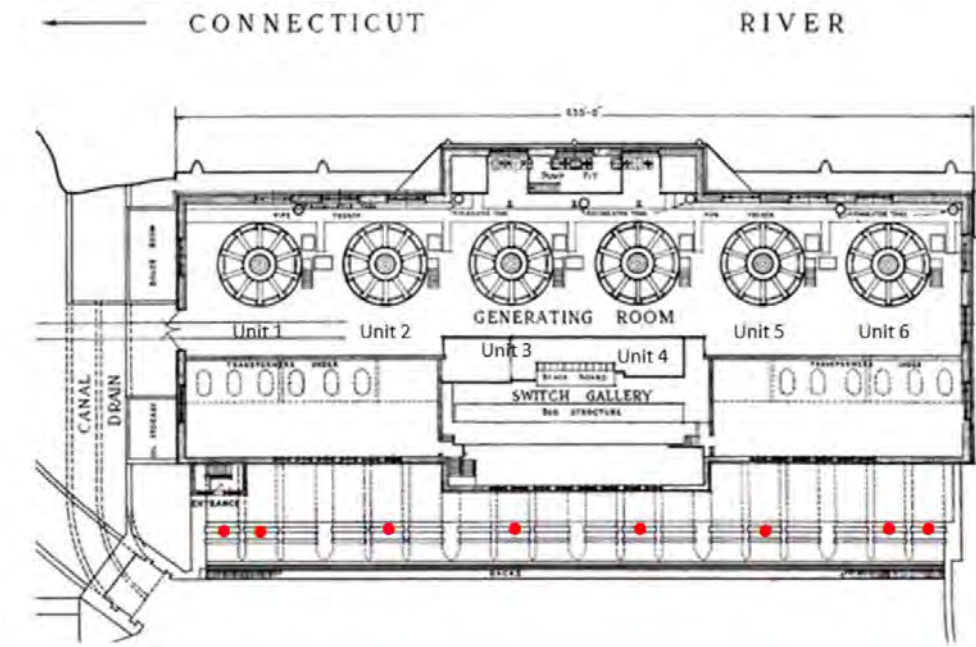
Plan view of Cabot Station, Turners Falls, MA. The red circles indicate the location of the split beam transducers used to monitor adult eel entrainment.
